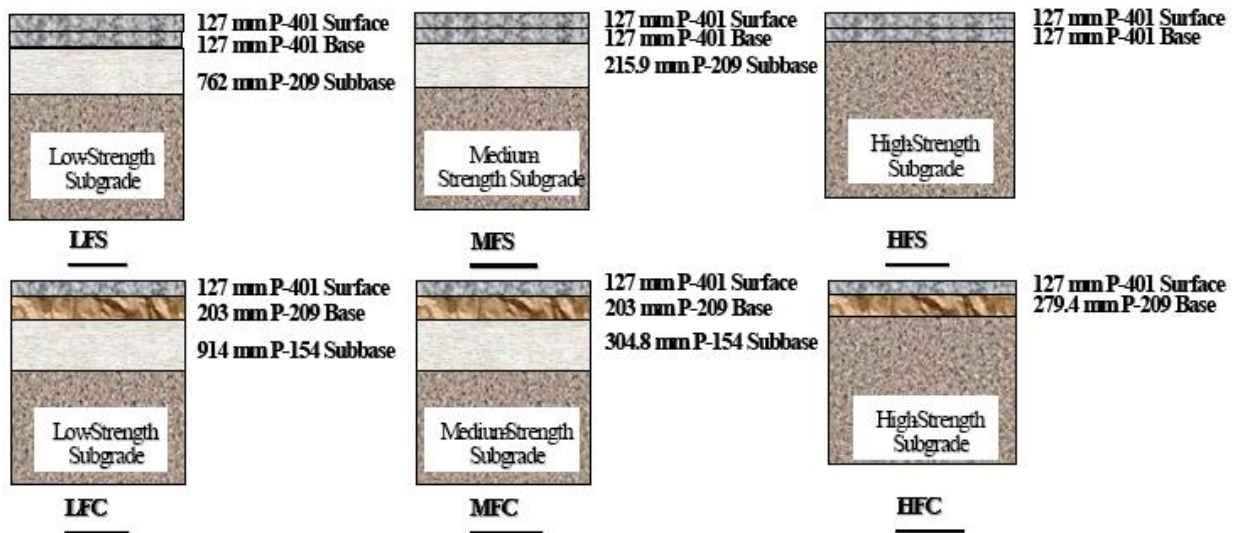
Cross Sections of NAPTF Pavement Test Sections (Kim, 2005)
